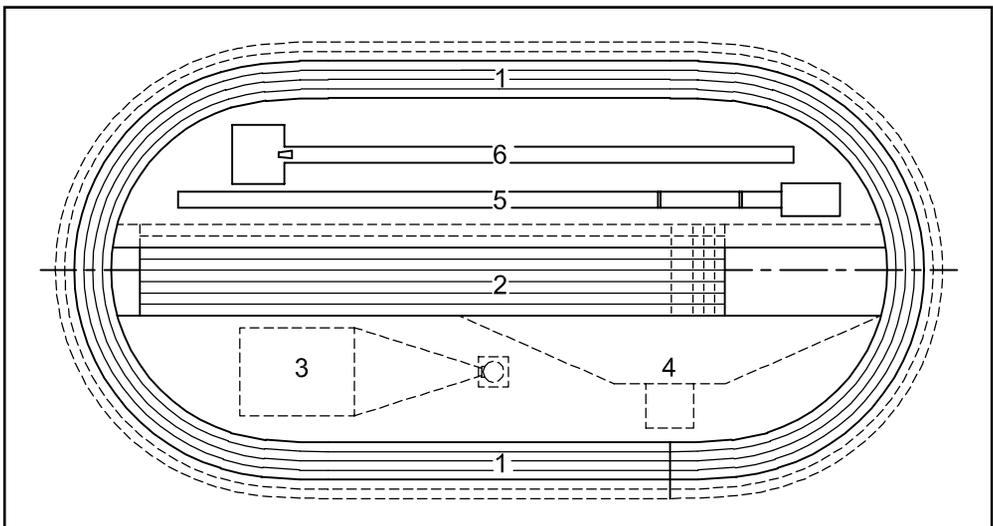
Layout plan of the 200m Standard Indoor Track
